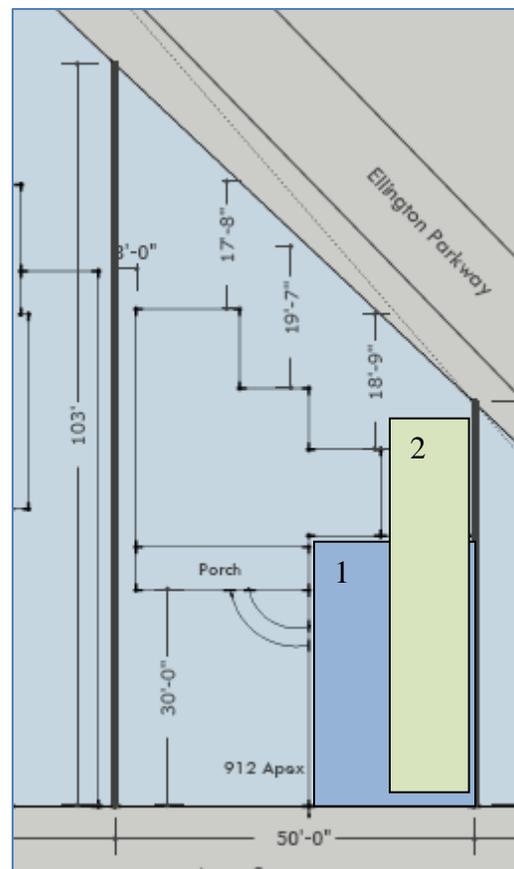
Box # 1 shows the proposed double-wide parking area and box #2 shows the suggested driveway.
